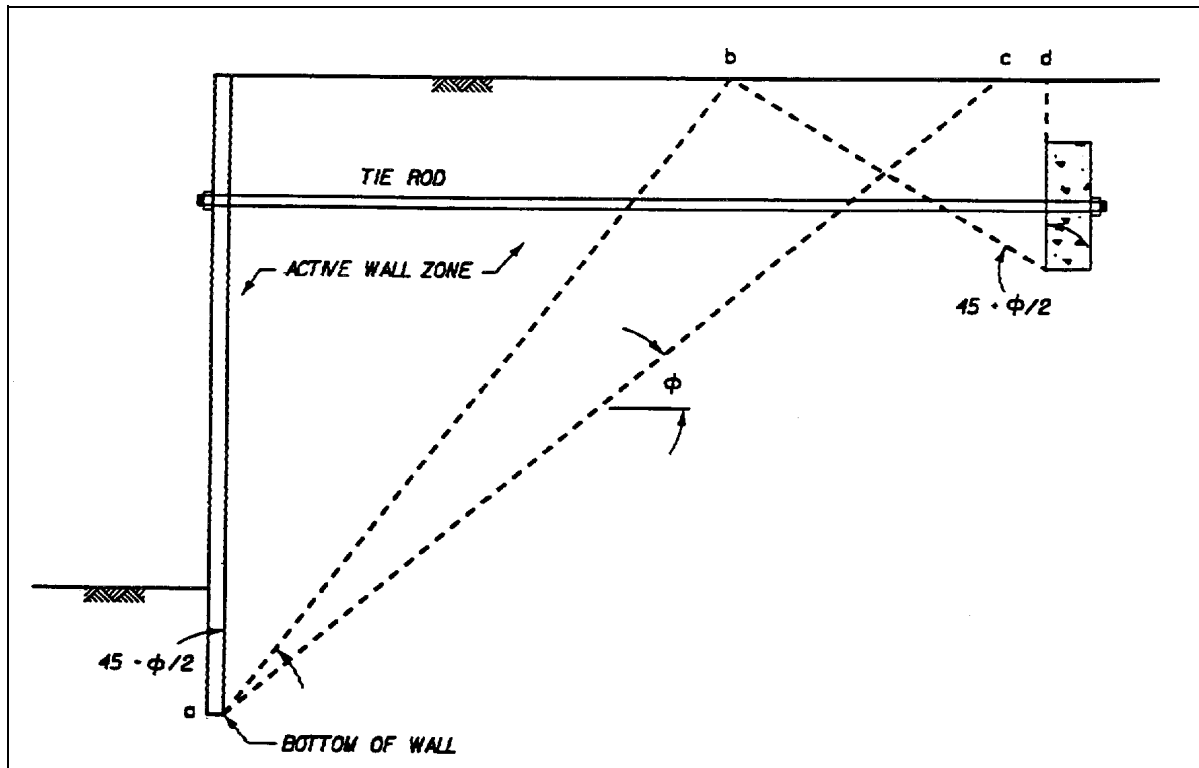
Minimum anchor - wall spacing for full passive anchor resistance in homogeneous soil
